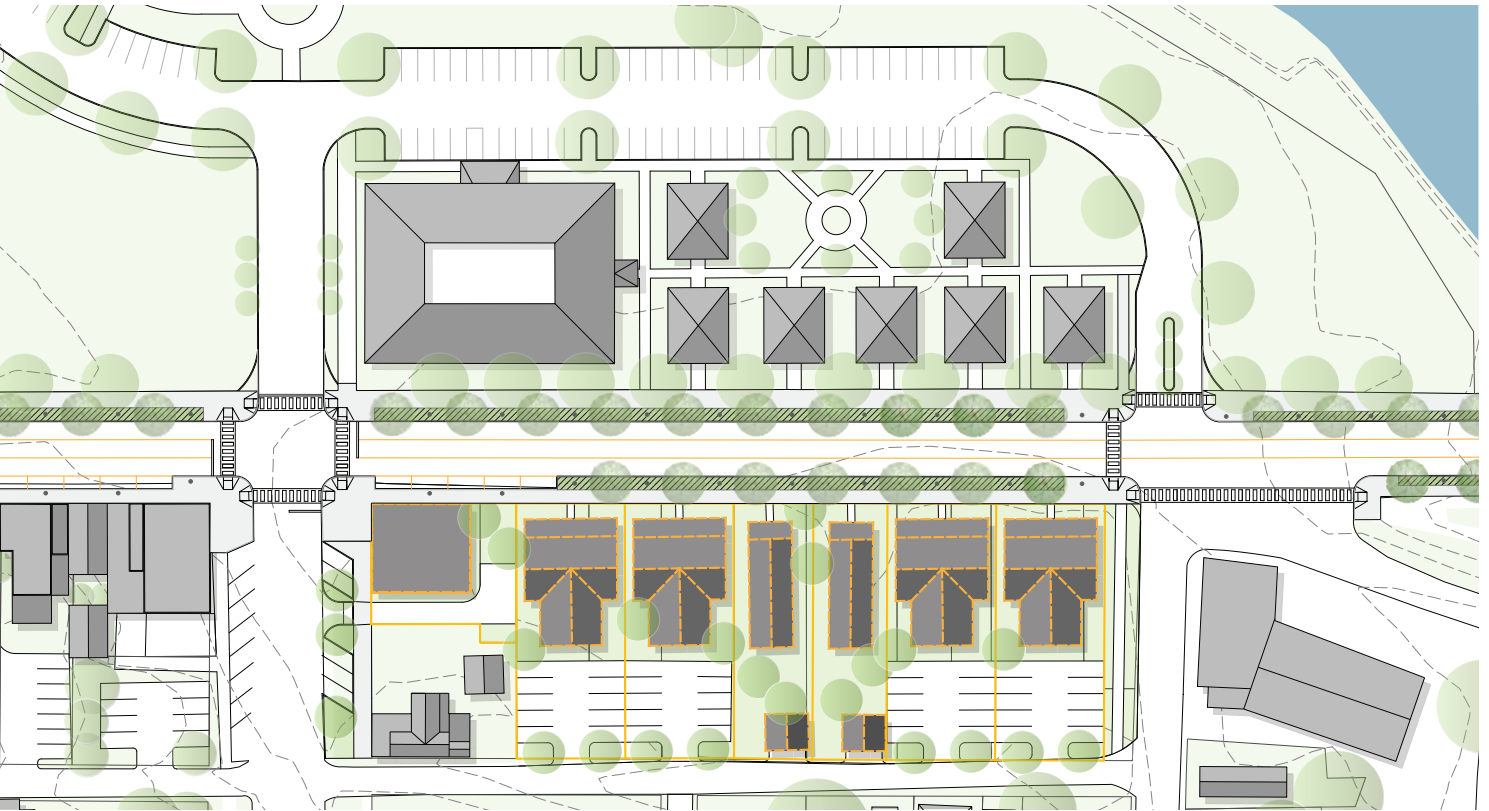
Before - Broad Street and Crawford Avenue Before Streetscape Improvement
